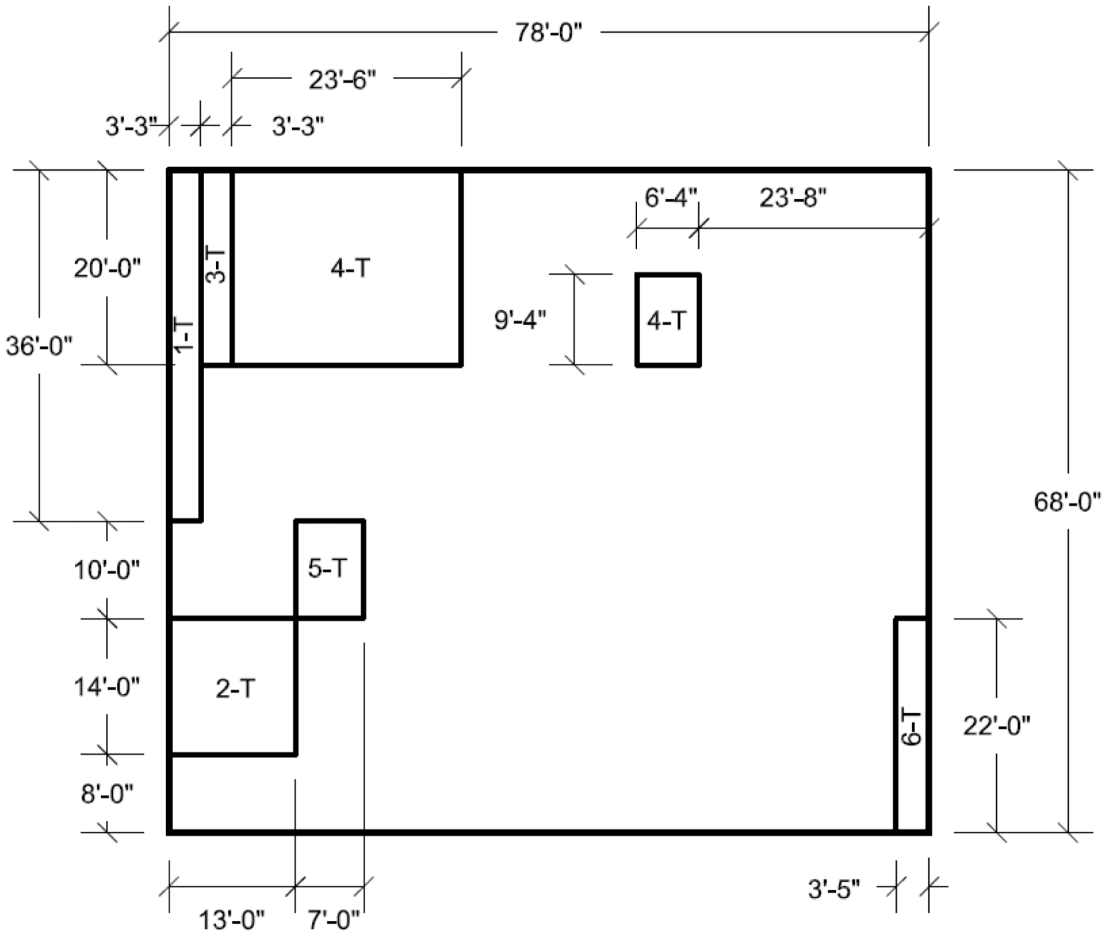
H.6-60 Pump House East Wall Looking West Transverse Reinforcement Zones
